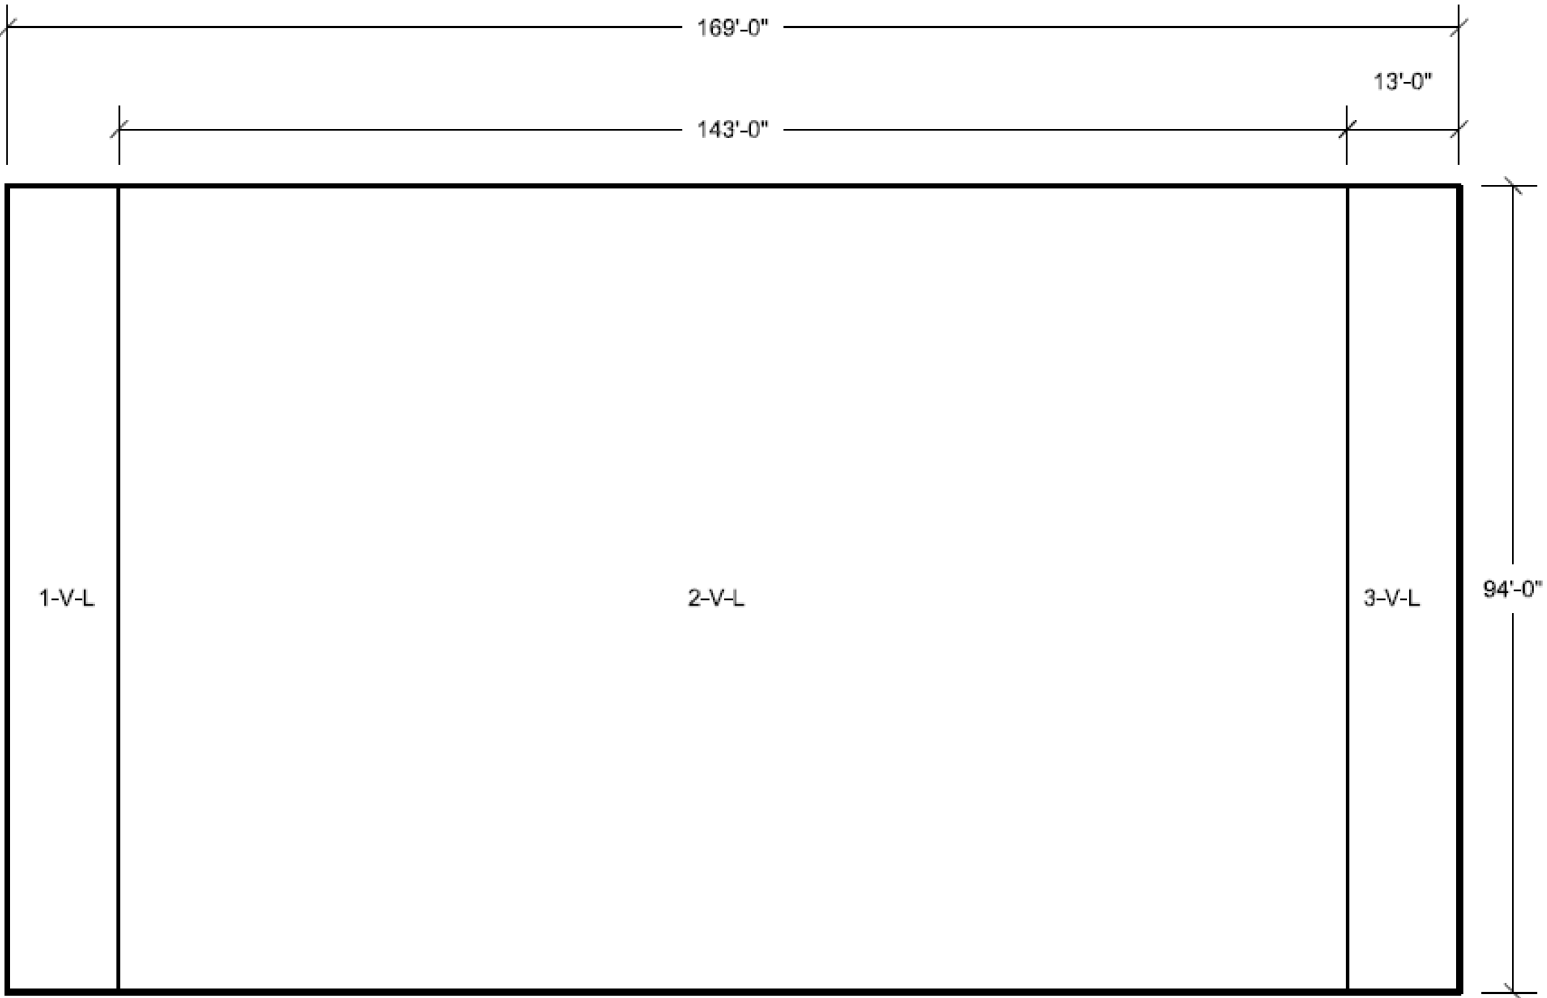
H.6-124 Pump House Foundation Mat North/South Reinforcement Zones Top Face
